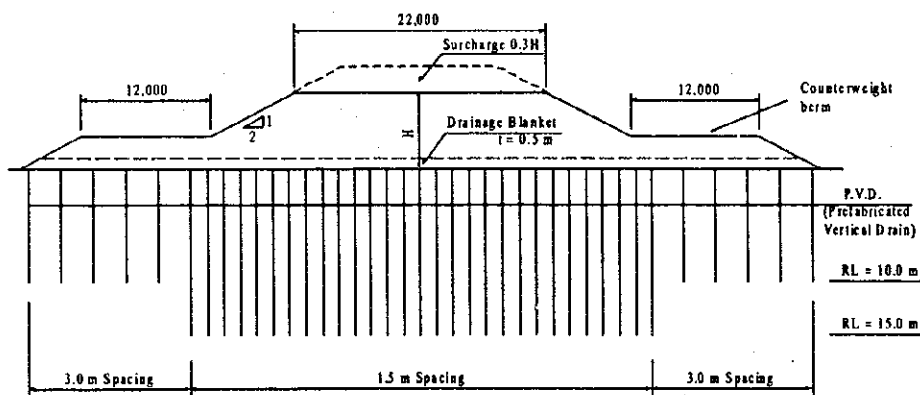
Typical Embankment Section with Soft Ground Treatment
